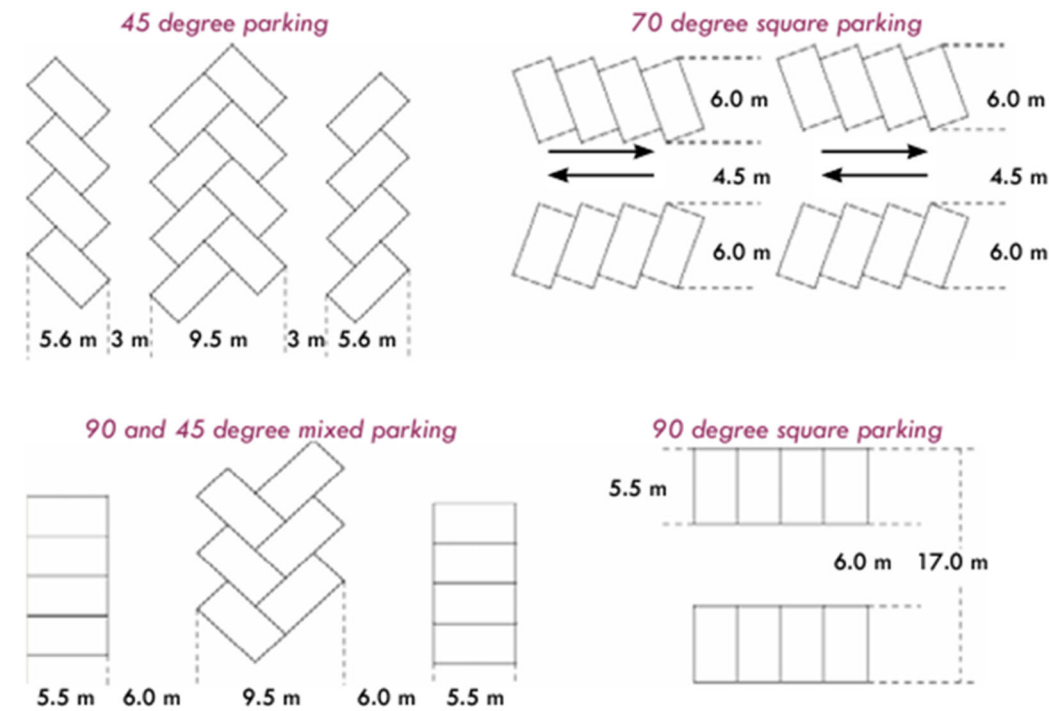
Examples of parking arrangements | National Roads Development Guide
